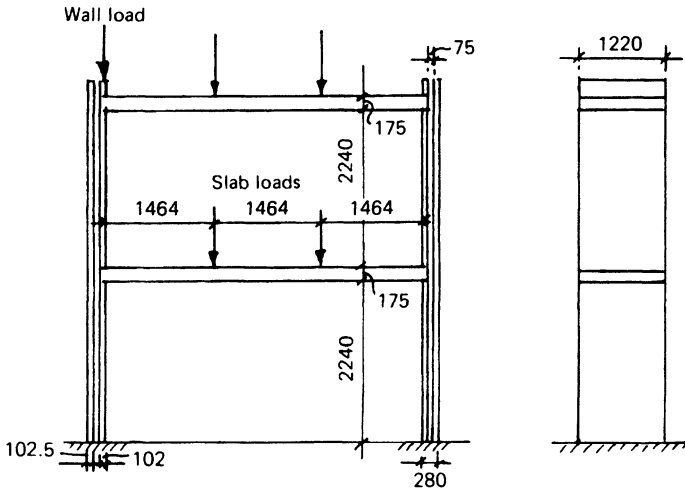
Test structure for wall–floor slab interaction with 102.5 mm single-leaf and 280 mm cavity walls
